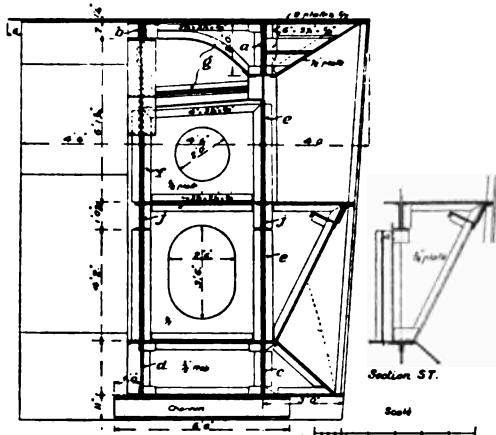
East Boston tunnel (A-13) roof shield. Longitudinal section.
